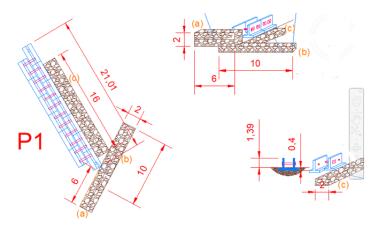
Plan Details - Foot Erosion Protection – Source: YPF SA
